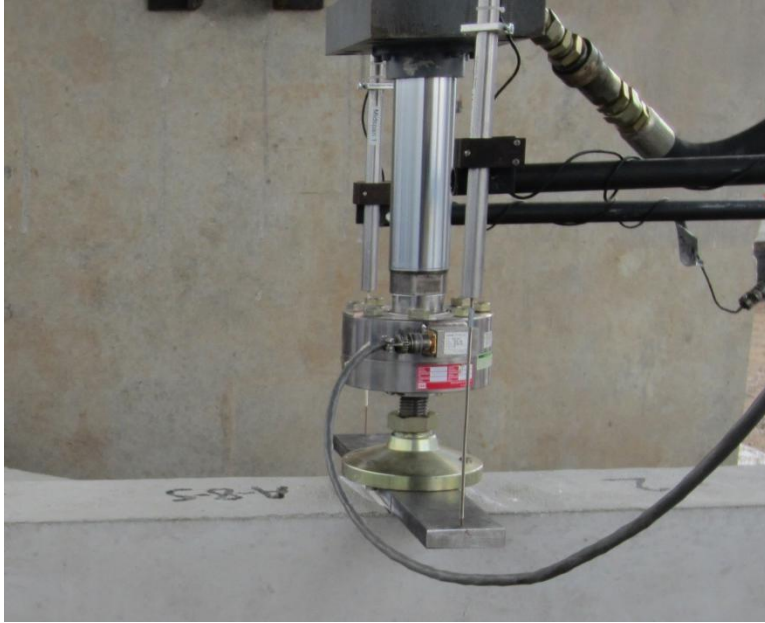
Beam Testing Setup: Load Application Point on Steel Plate, LVDTs
